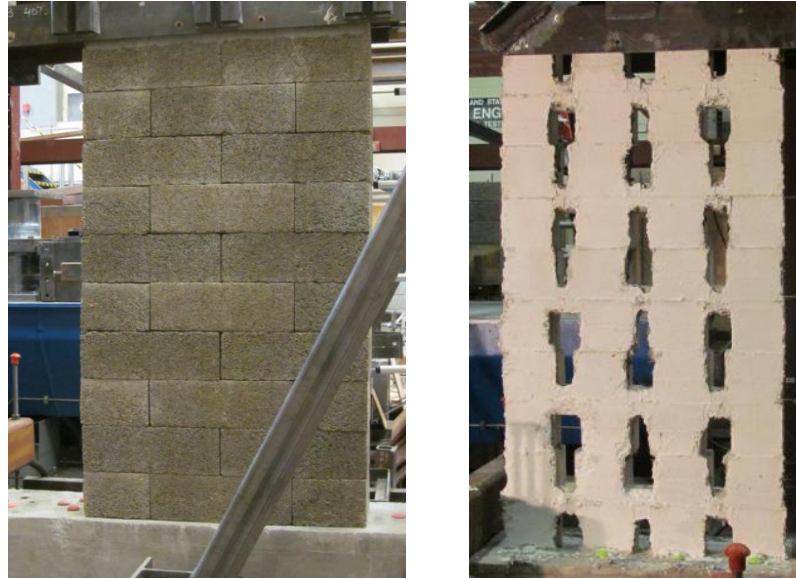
Four-foot walls with (left) and without (right) wall forms.
